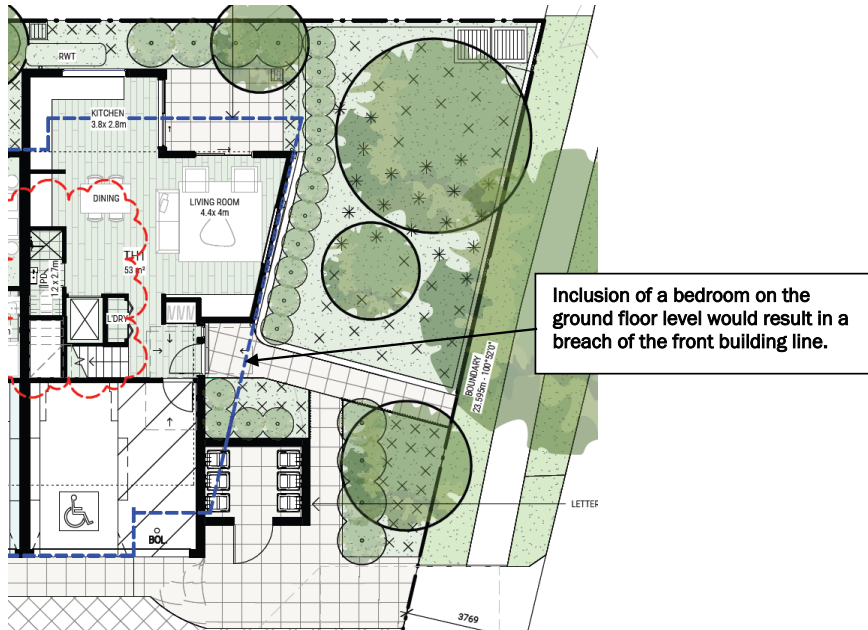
excerpt of the ground floor plan showing the configuration of dwelling 1, the lift, and the location of the front setback
